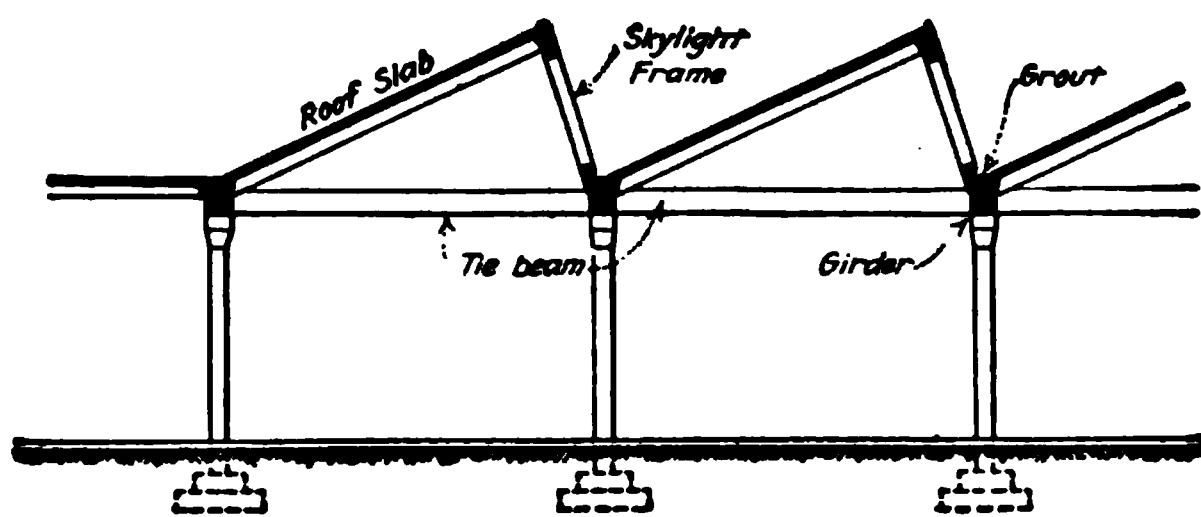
Cross-section showing typical arrangement of units in sawtooth construction, *Unit-bilt* system.
